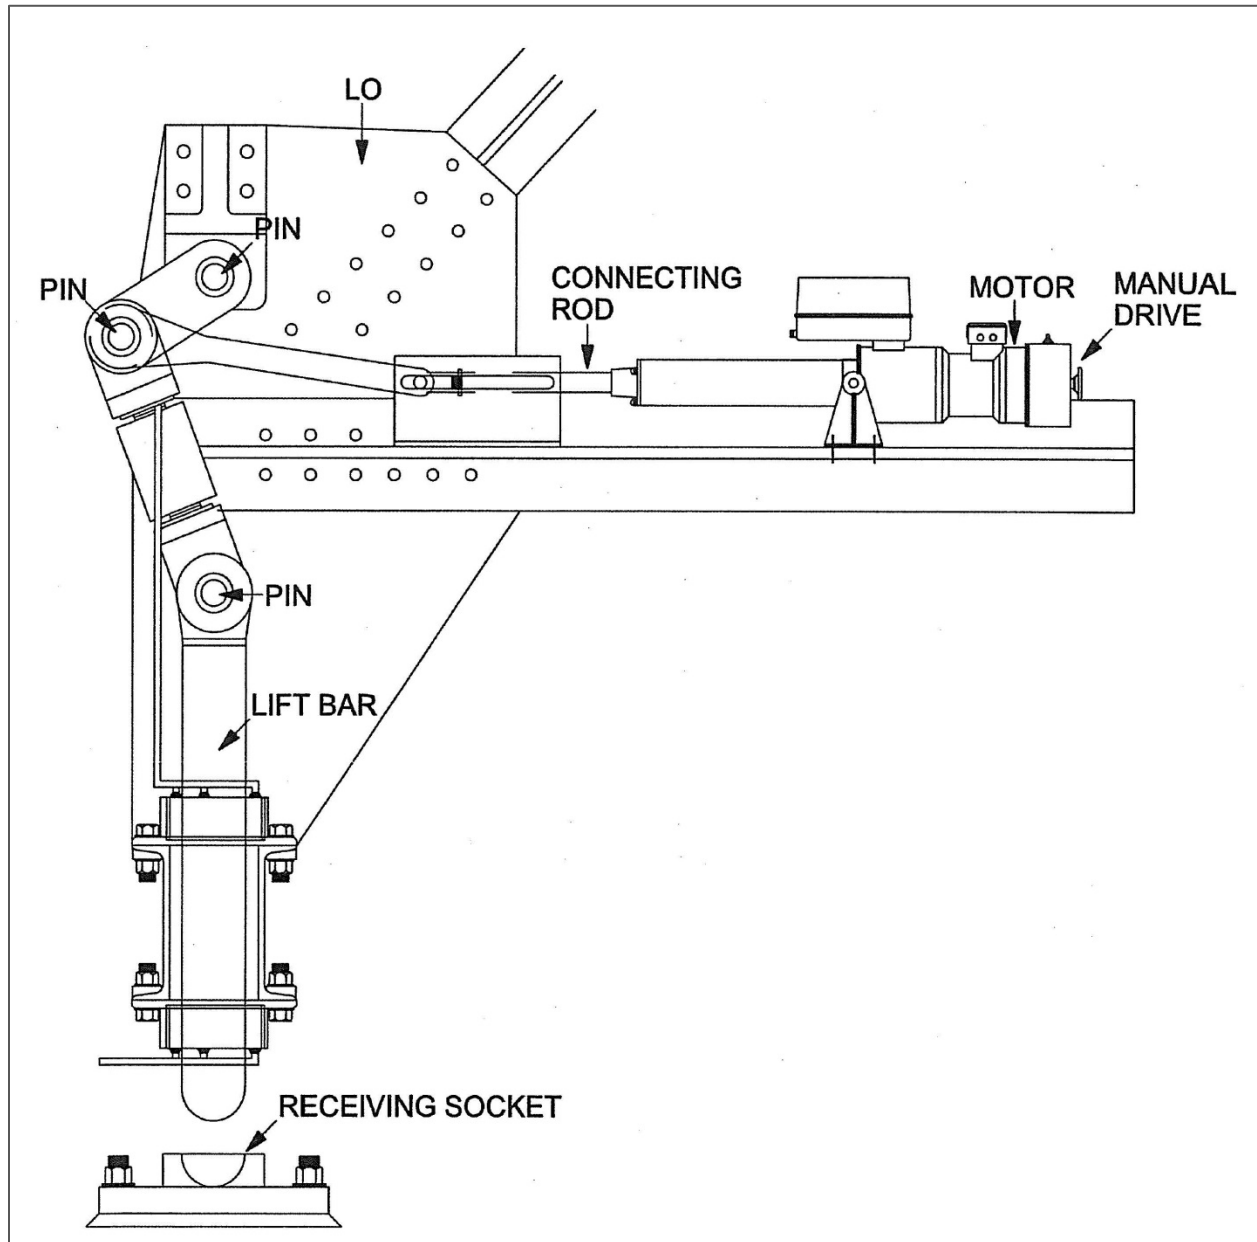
Span Drive and Emergency Drive Machinery Layout – Elevation View Looking East
